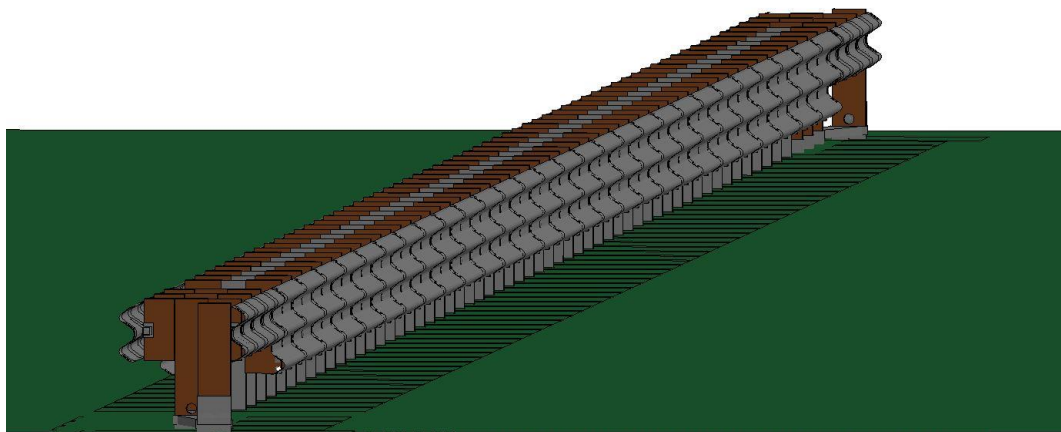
Full FE model of the double-faced 29-inch wood-blockout Thrie-beam guardrail.
